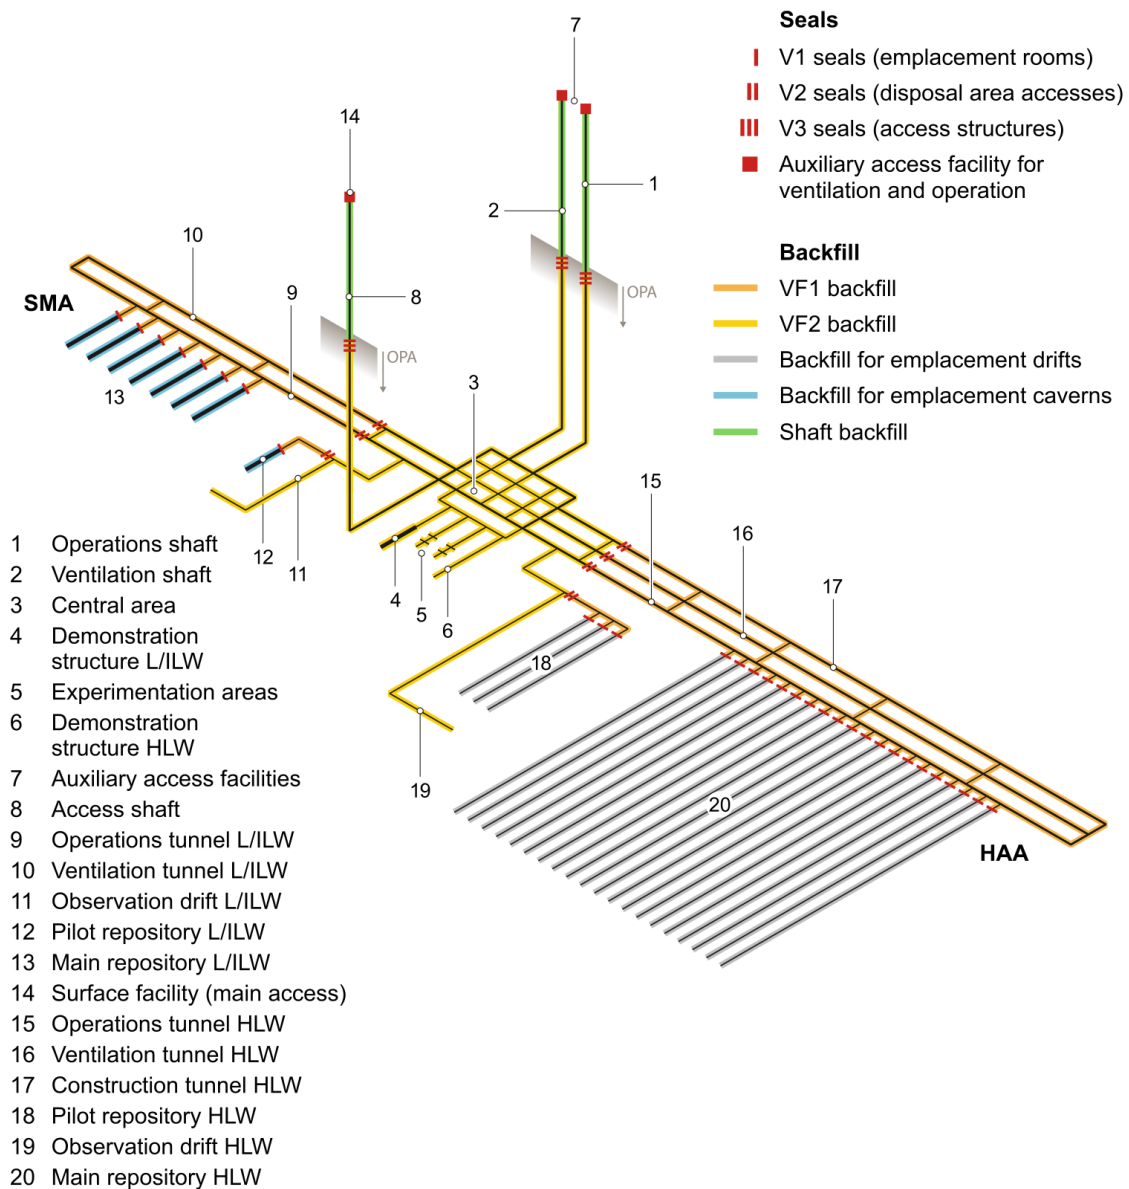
Schematic view of the underground facilities in the provisional design, including sealing and backfill of the repository structures
